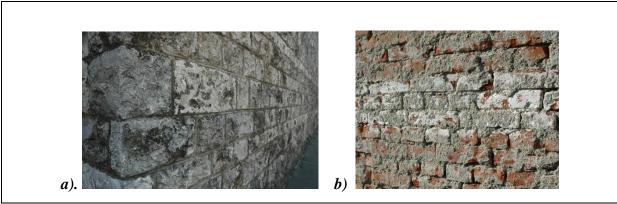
Material used in existing walls of the building: a) external wall with stone; b) external wall with bricks without plaster⁷⁴
